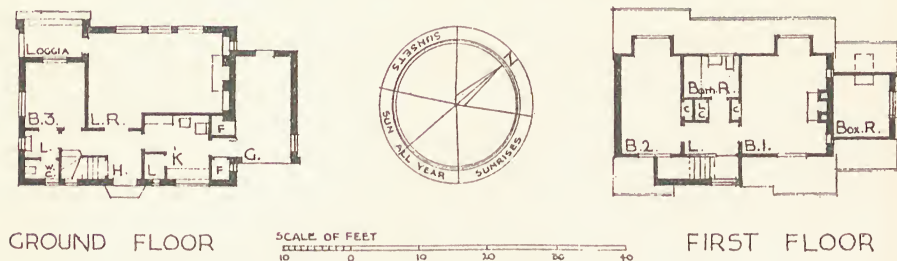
PLAN OF COTTAGE AT WELWYN GARDEN CITY
